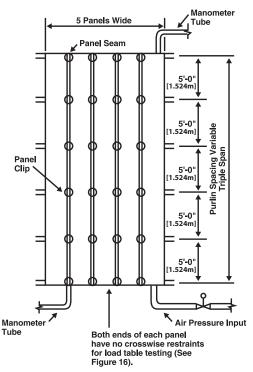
ASTM E1592—Test Chamber and Panel Layout.
